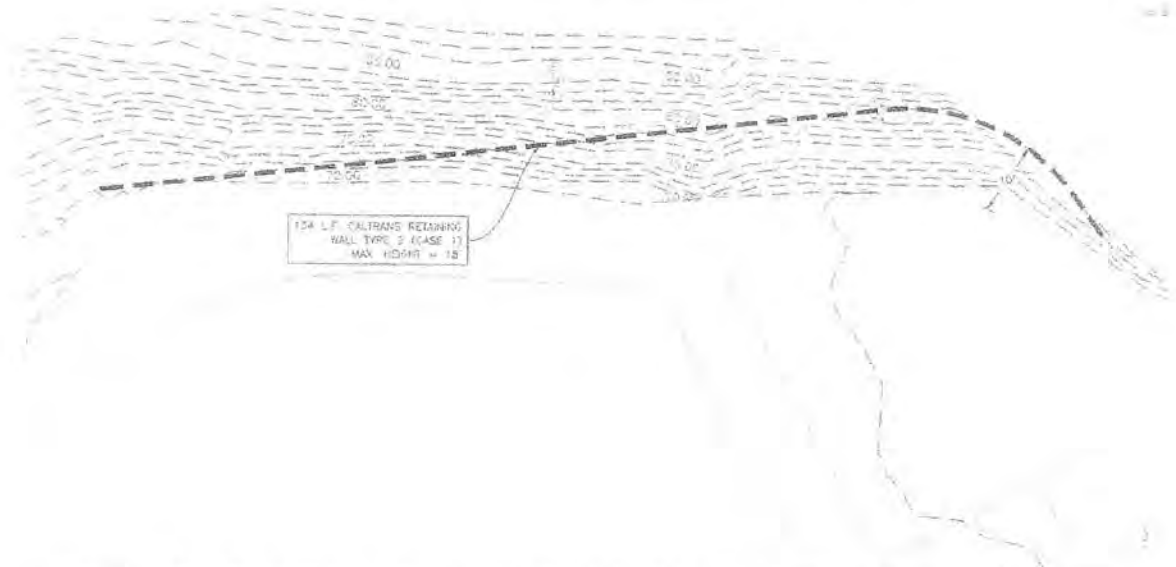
Wall alignment analyzed for CALTRANS typical tapered retaining wall design.
